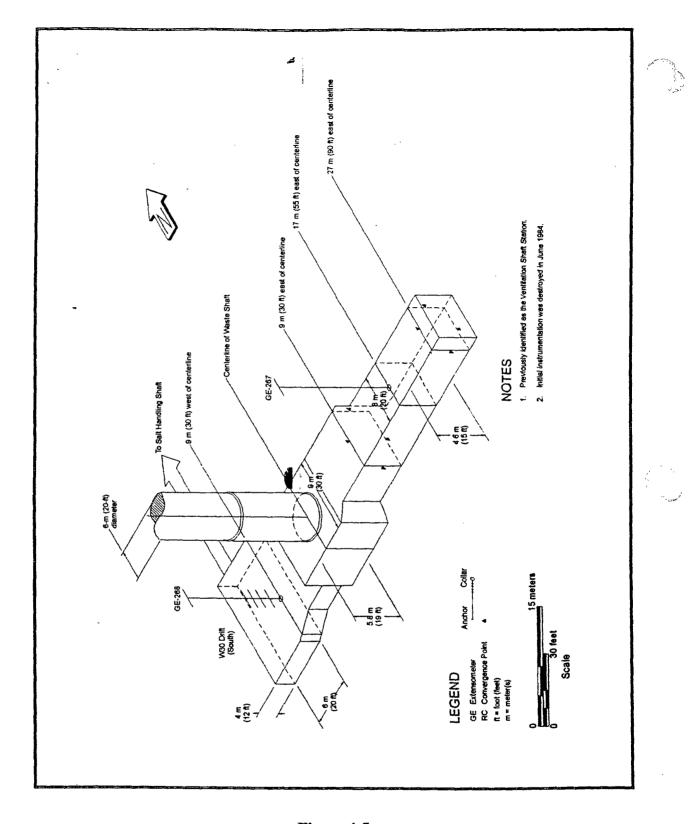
Waste Shaft Station Instrumentation Before Wall Trimming
